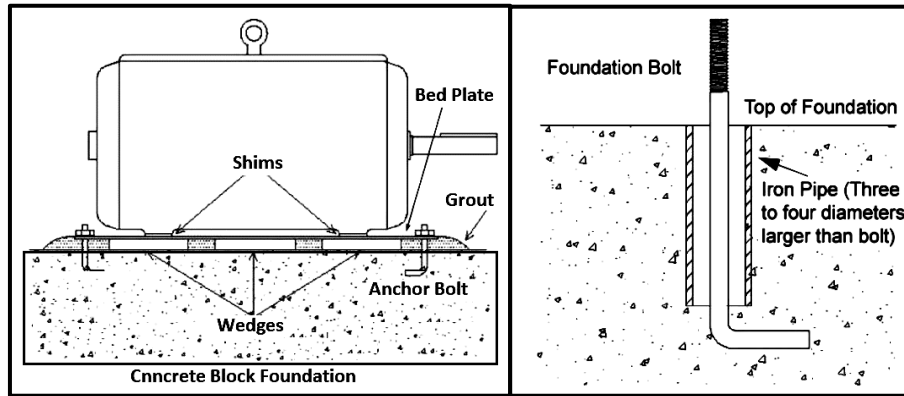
Motor fitted on concrete block foundation (left) and a foundation anchor bolt in place (right)
